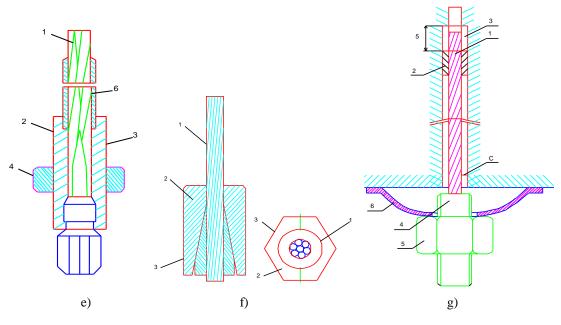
Layout of the rope anchor with a wedge clamping connection in the supporting sleeve, sheet 1
